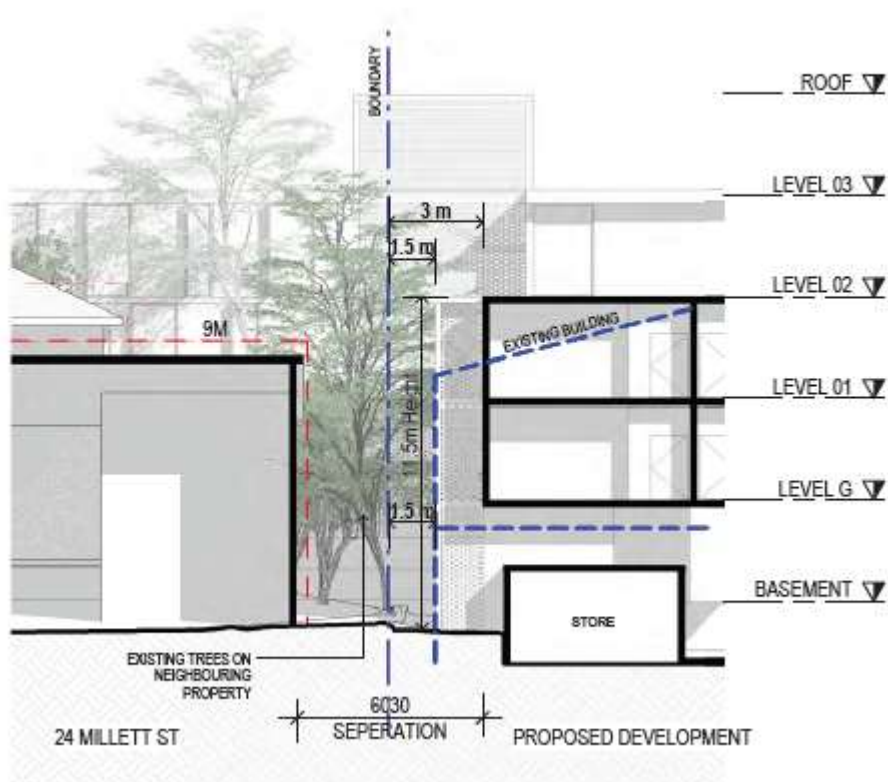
North Western Boundary Section Plan*Source: O'Neil Architecture
